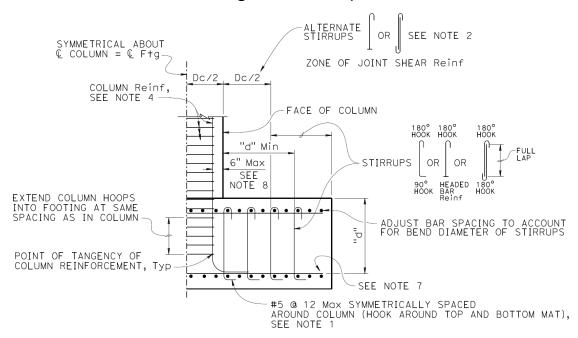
Footing Reinforcement Fixed Column (see also Seismic Design Criteria Figure C6.2.2.5-2)
